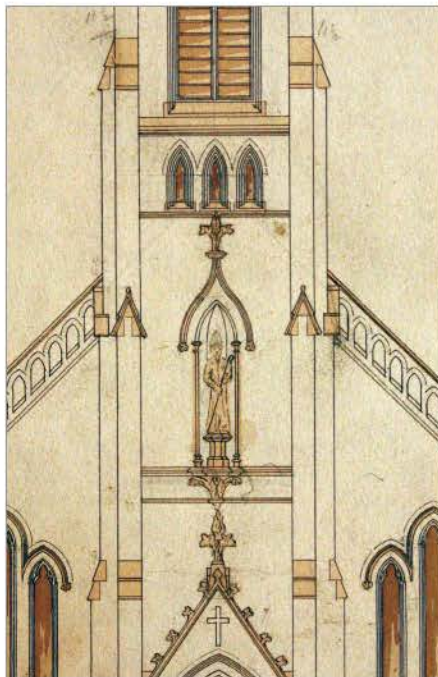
ST. PATRICK'S CATHOLIC CHURCH, TORONTO, ARCHITECTURAL DRAWING – DETAIL OF ST. PATRICK, GUNDRY AND LANGLEY, ARCHITECTS. | COURTESY OF TORONTO PUBLIC LIBRARY, BALDWIN ROOM.
